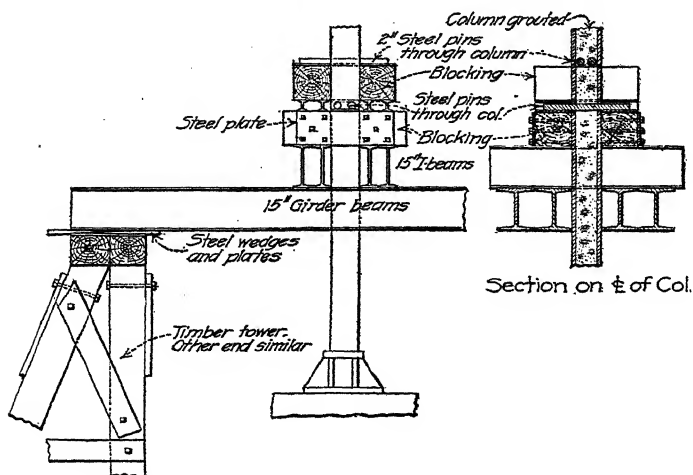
Needling for 12-in. cast-iron column. Load, 250 tons per column.
